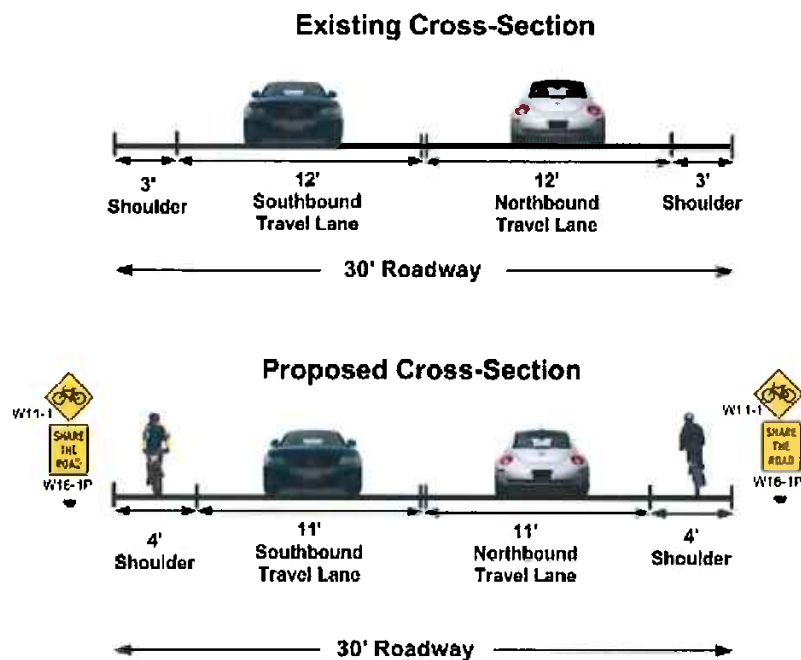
Shoulders on Broadway between Spring Street and Dutch Lane Road
